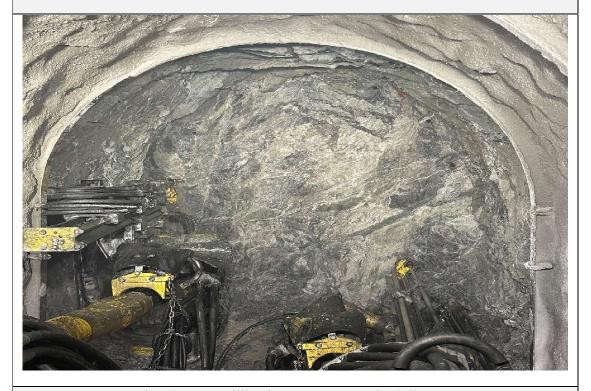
Face Drilling by Boomer at Outlet (F8) HRT
